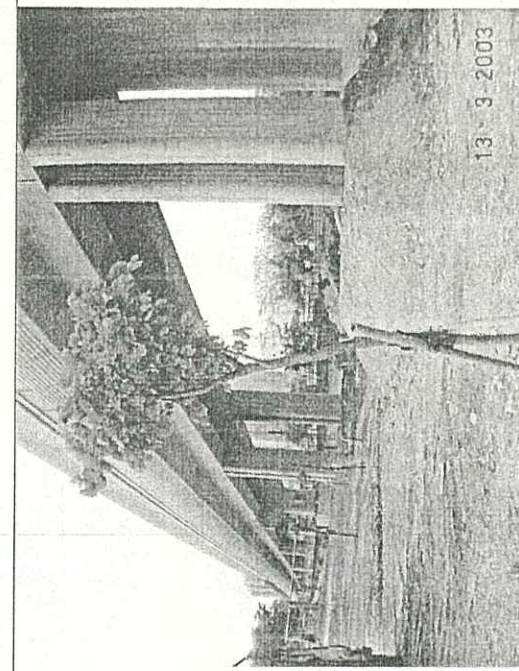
Landscape Planting at Lam Tei (Piers 67-70)
